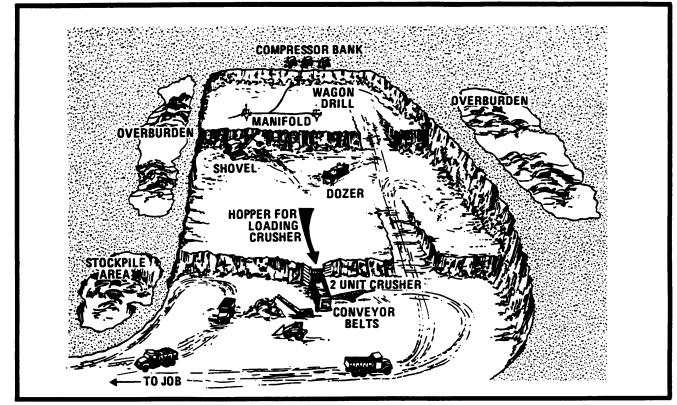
Layout of a Typical Small-Scale Quarry Complex
